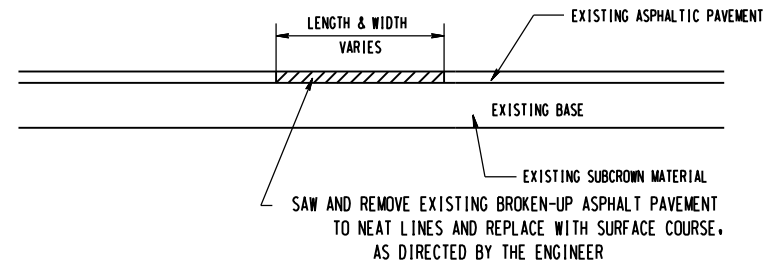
DETAILS OF REPAIRING EXISTING PAVEMENT PRIOR TO RESURFACING FOR FULL DEPTH AND MILLING
